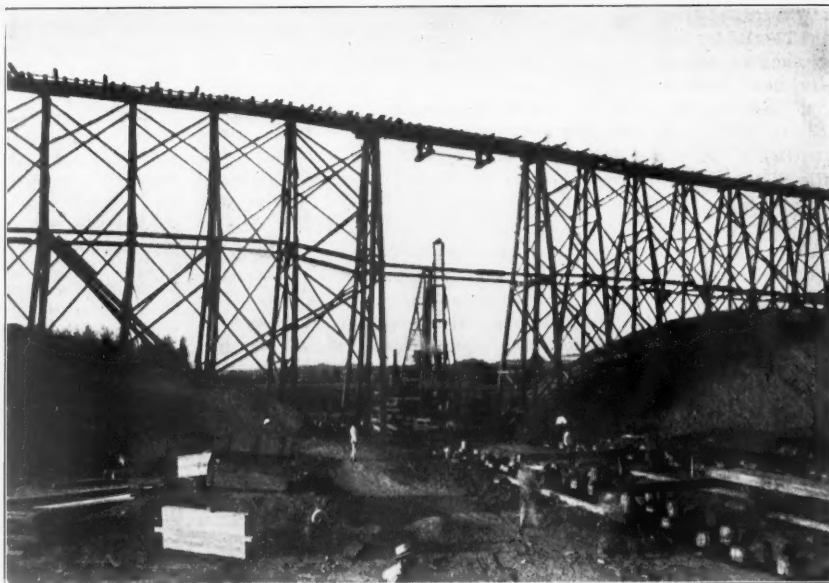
Driving 40- and 50-Ft. Piles for Foundation of Concrete Highway Arch Under 60-Ft. Embankment. Timber Trestle Over Valley of Big Papillion Shown at Extreme Height of 64 Feet.
